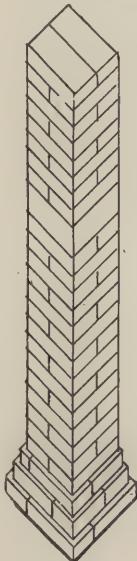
8-IN. BRICK PIER WITH BOND STONE.
